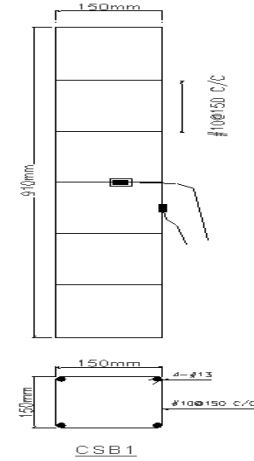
Overall dimension and reinforcement details of test specimen CSB1
